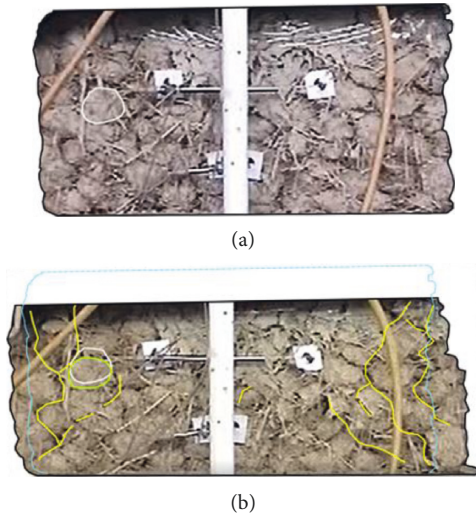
(a) Initial state and (b) typical crack pattern after the reaching of compressive strength. The flattening of a single cob element is also highlighted. Yellow lines: cracking; white line: undeformed shape of the cob element before testing; green line: deformed shape of the cob element after testing; blue dotted line: cob wall in undeformed shape.
